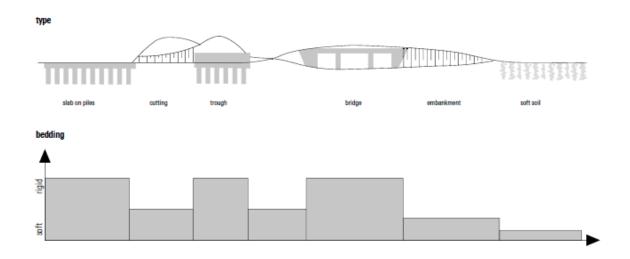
Slab track construction with varying bedding modulus (SSF Ingenieure GmbH, 2011)
